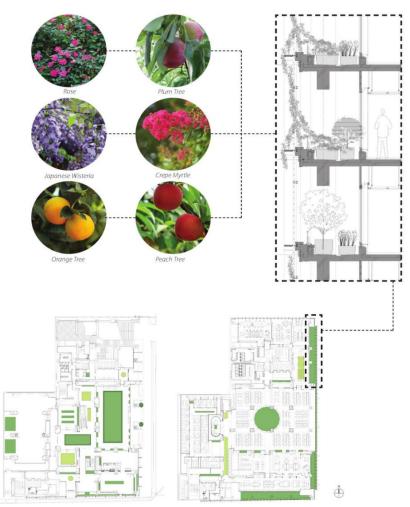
Floor plans of the 1st (left) and 4st (right) floors showing locations of internal and external farming space (CTBUC, 2014)
